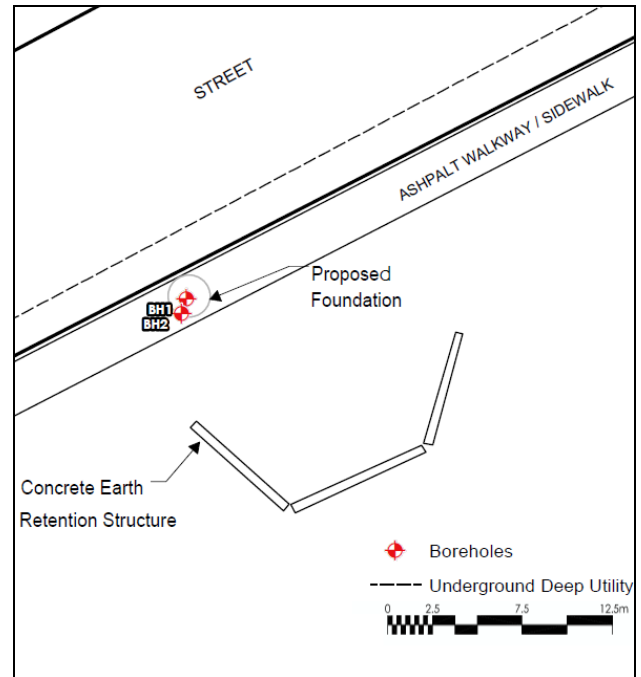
Proposed foundation location showing proximity to surrounding infrastructure
